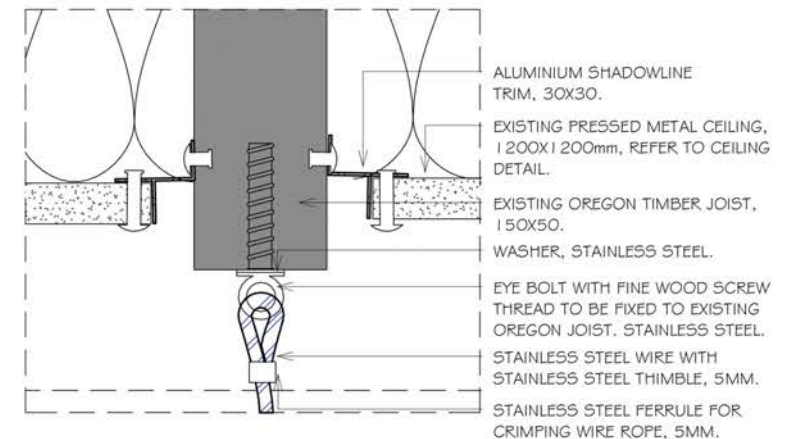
Detail 6 suspended grid to joist, not to scale (Author 2018)
